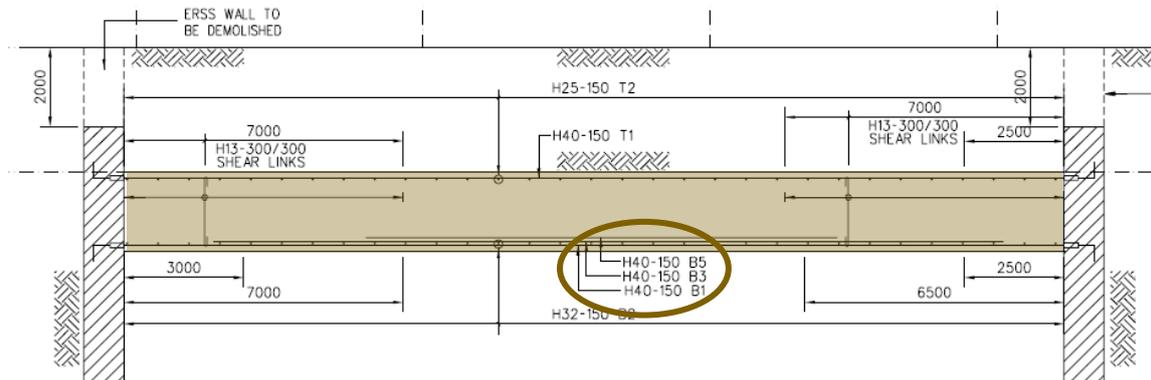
Basement Slab Built In-Between Two Walls
